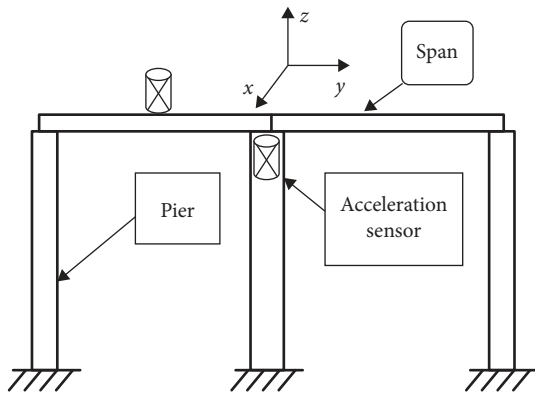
Plan for arranging location of vibration measurement points at Ben Noc bridge.
